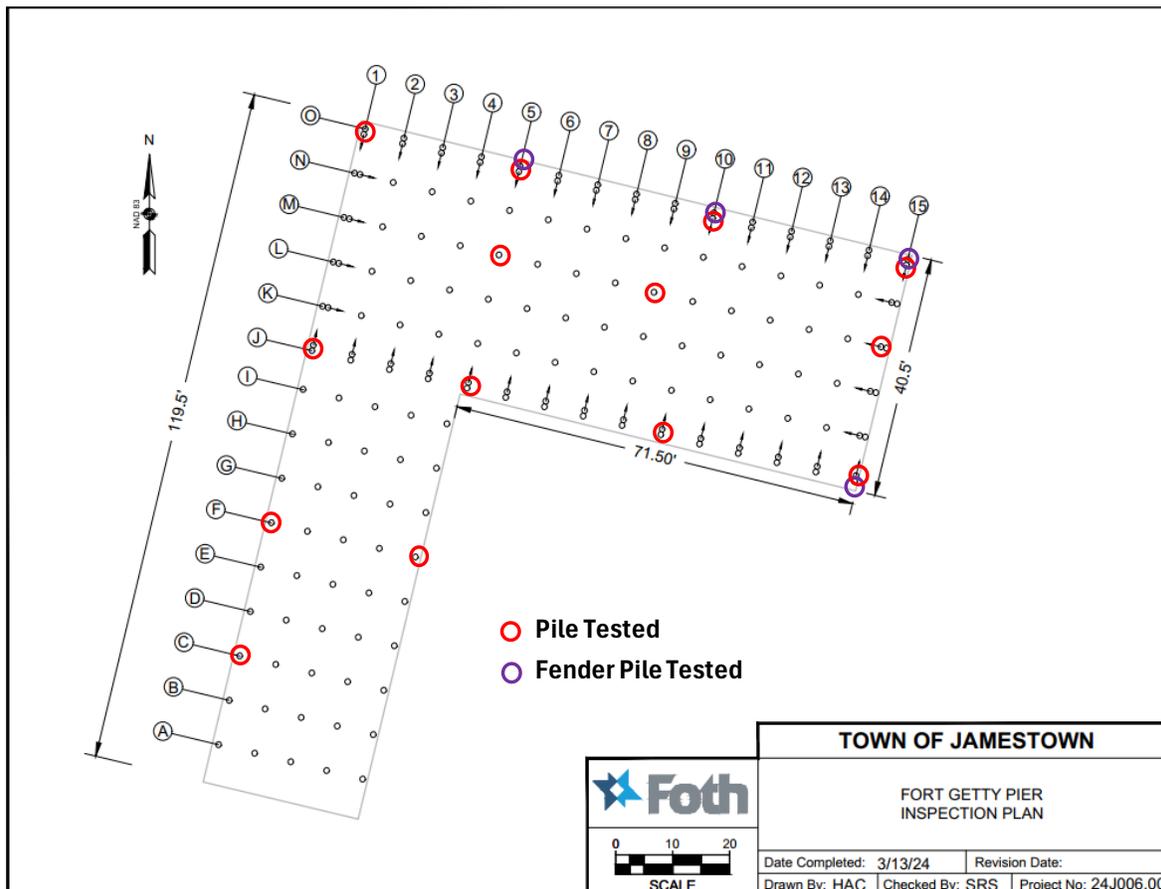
Inspection Plan for Fort Getty Pier with locations of piles test.
